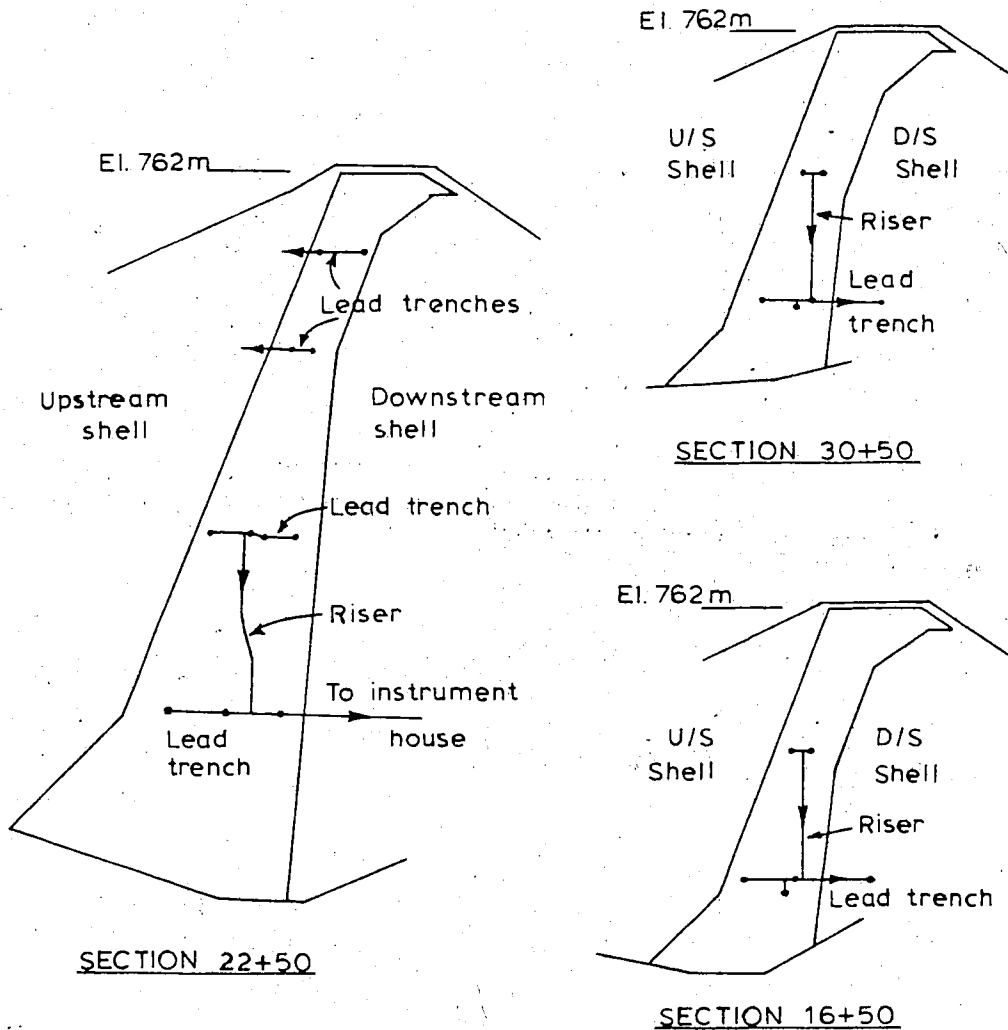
Location of Instrument-Lead Trenches and Risers
